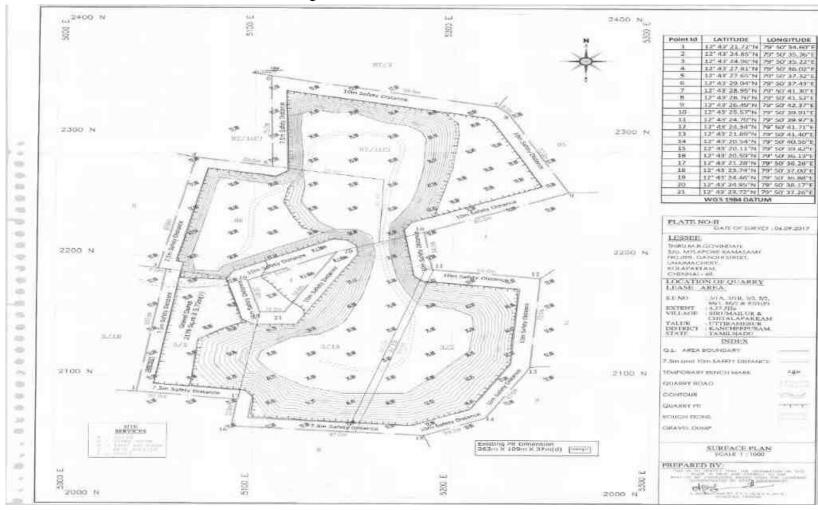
QUARRY LEASE PLAN / SURFACE PLAN-P2
